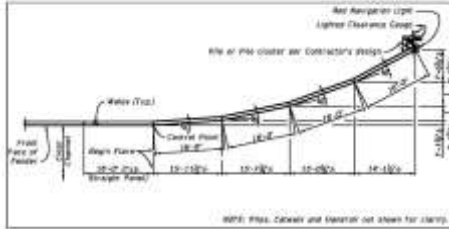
Partial Schematic Plan View of Fender System Flared Section
